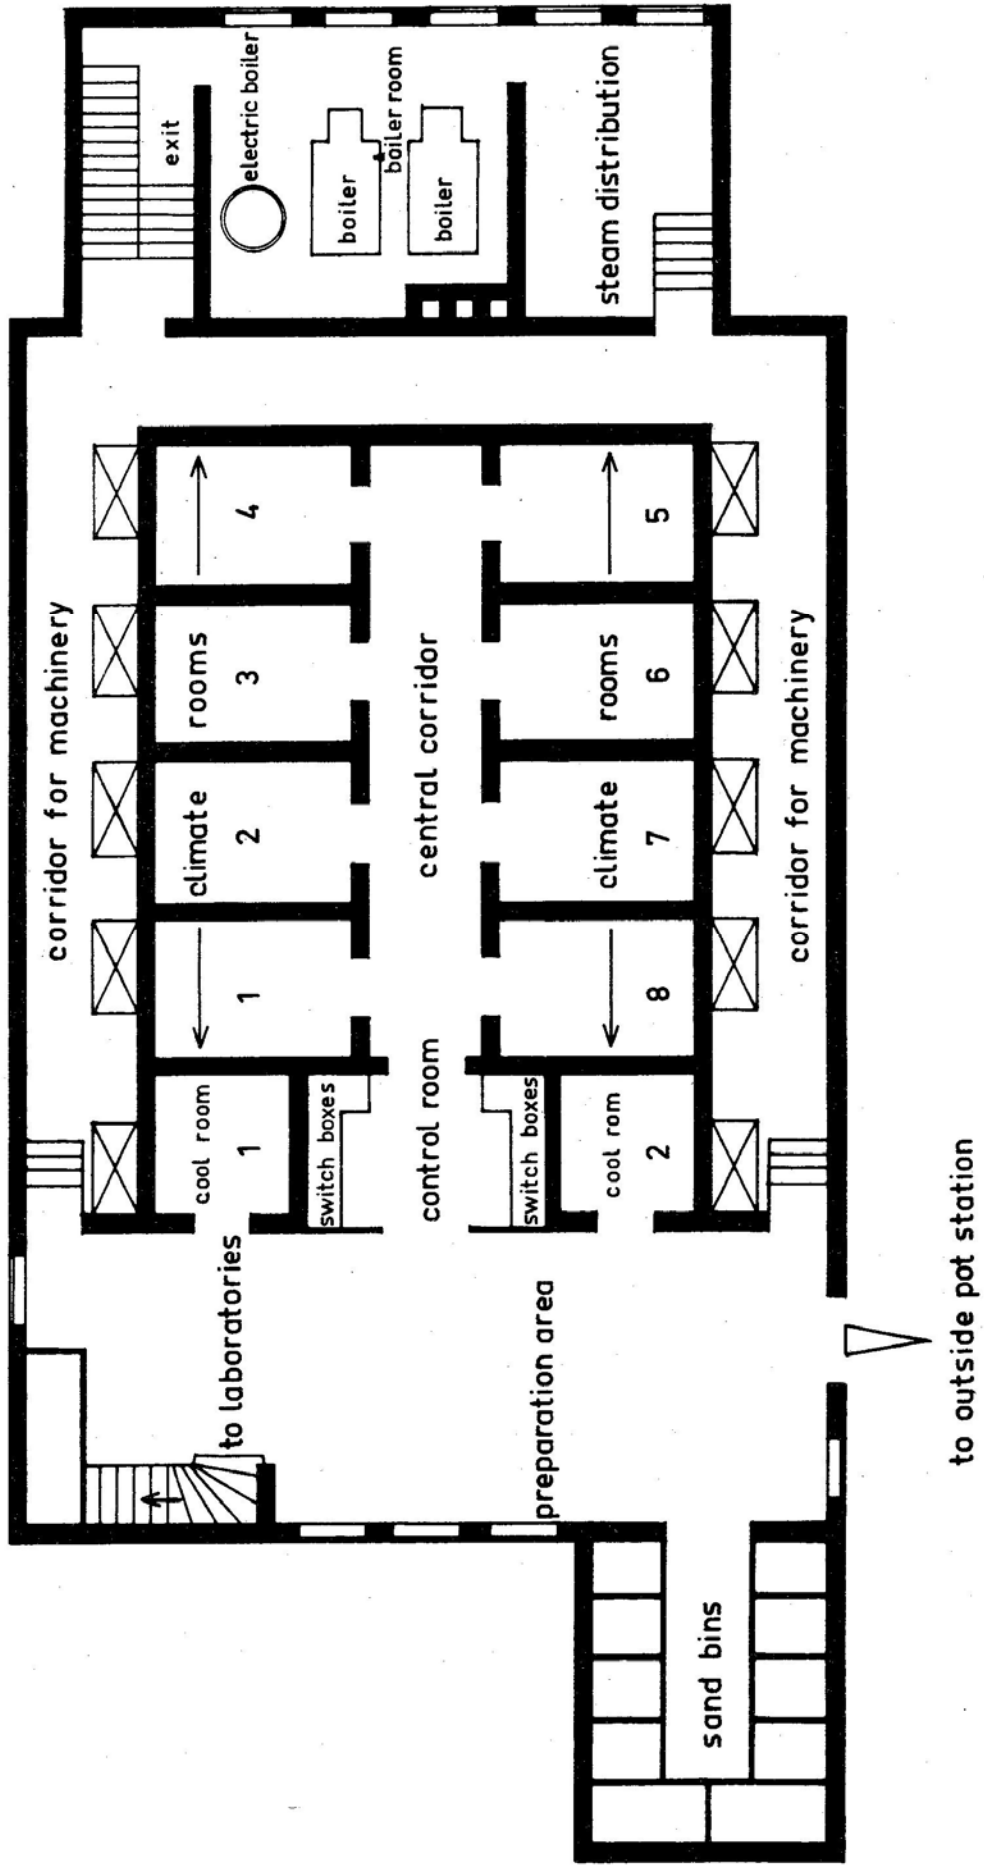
Ground floor plan of the Phytotron Rauich-Holzhausen.
